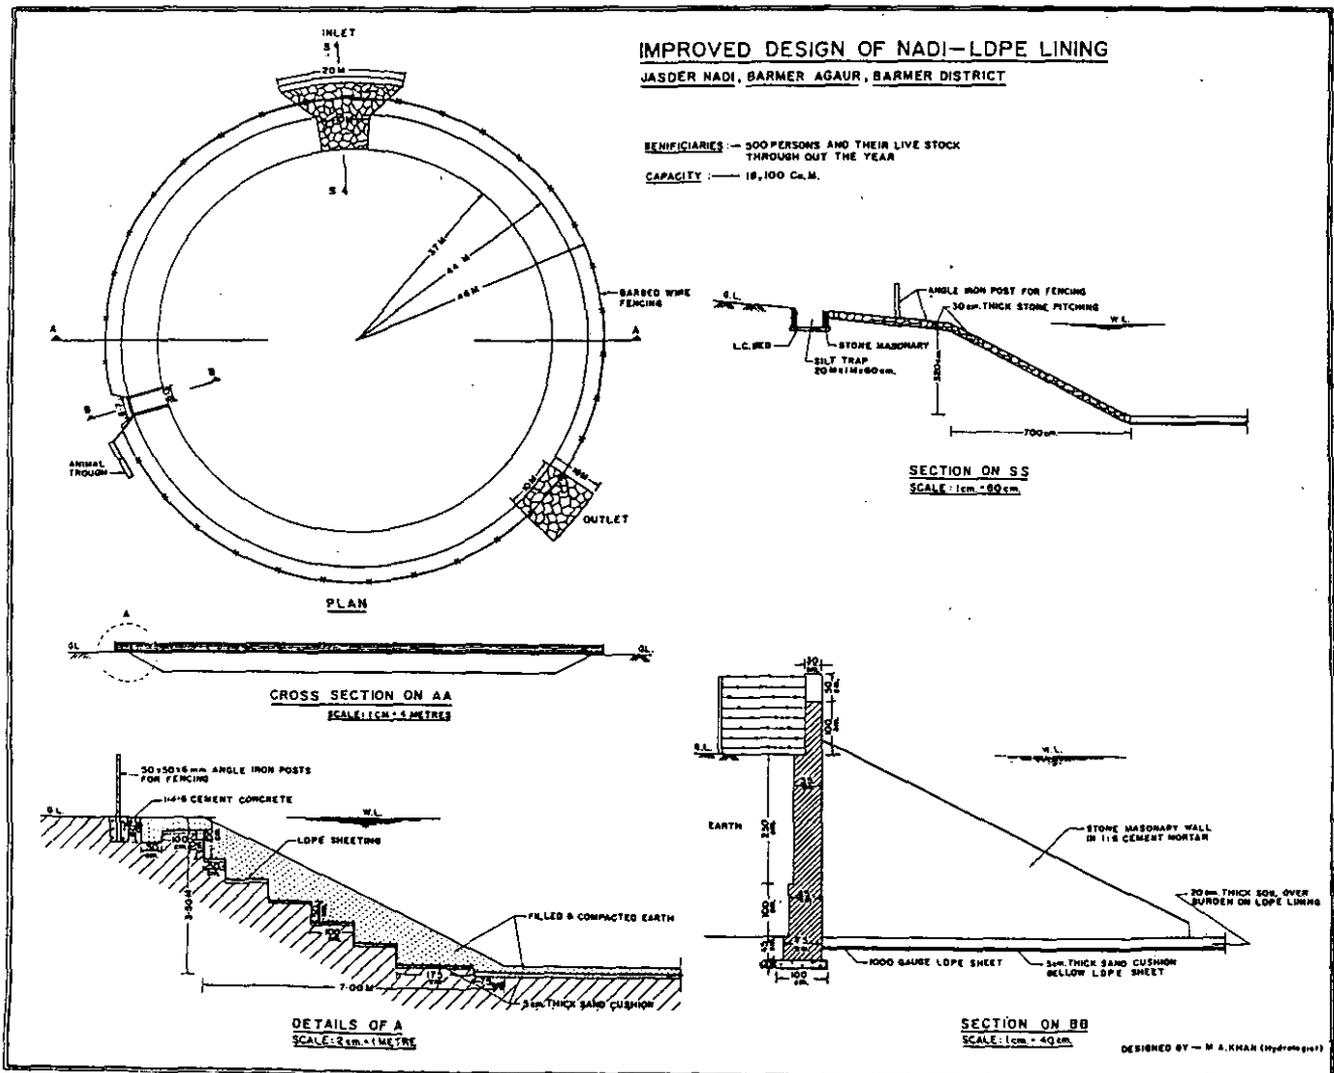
Improved design of nadi with LDPE lining developed by CAZRI, Jodhpur.
